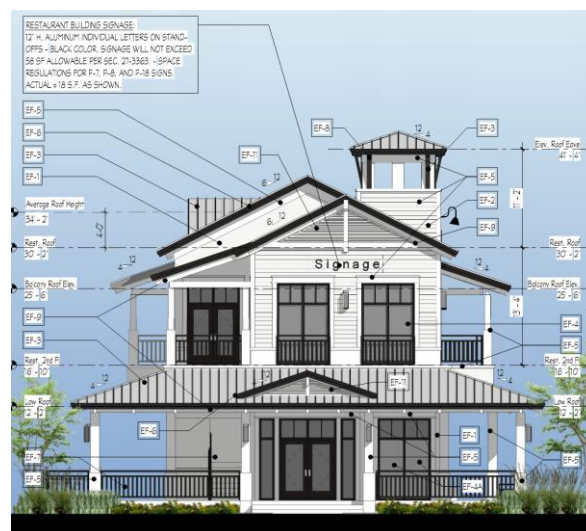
Building Elevation – West (Facing N. Alternate A1A)
